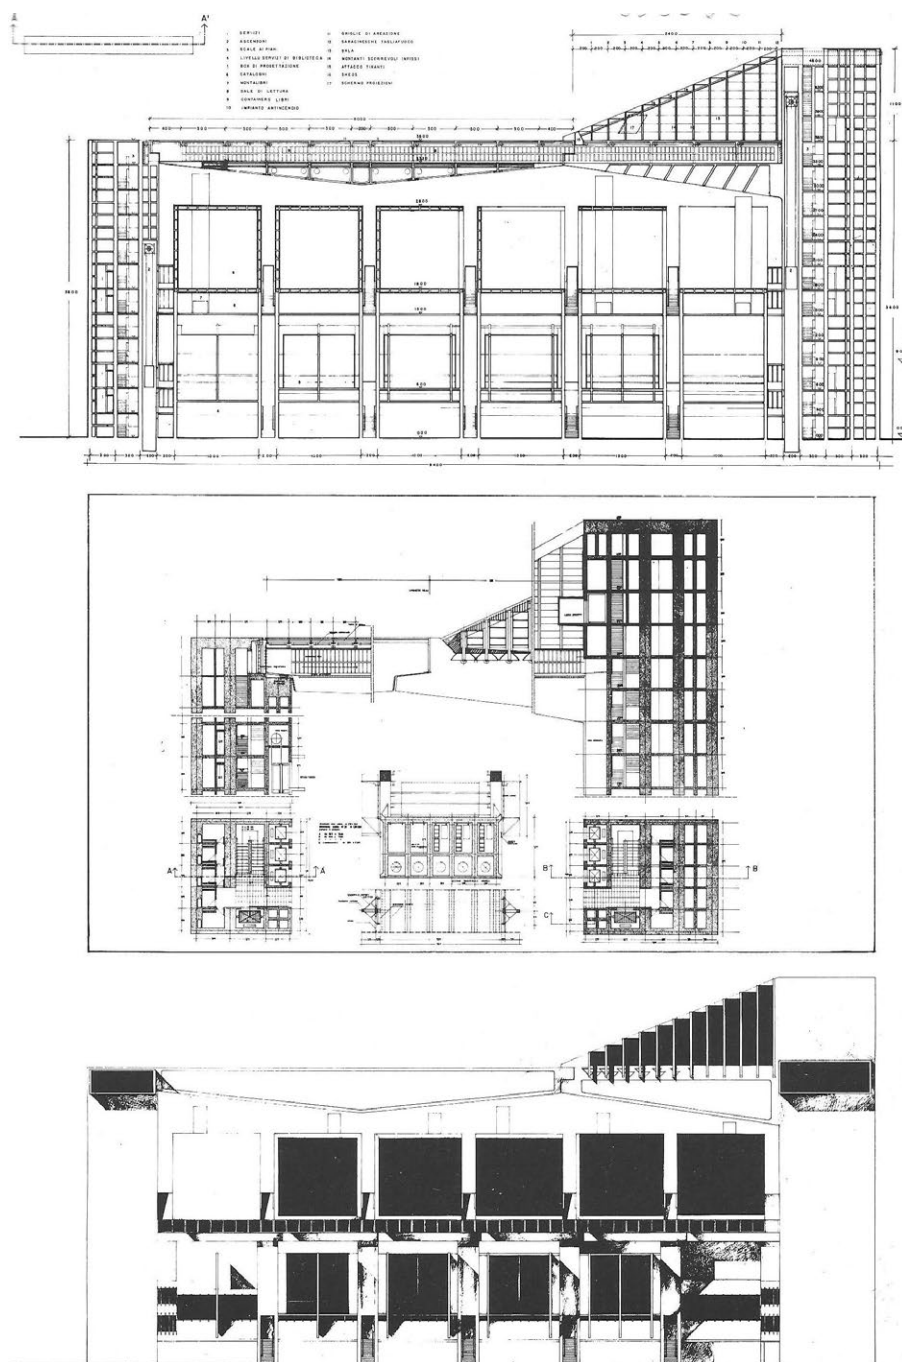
From top to bottom: Cross section; Details of the joints of the bridge structure; Façade.
